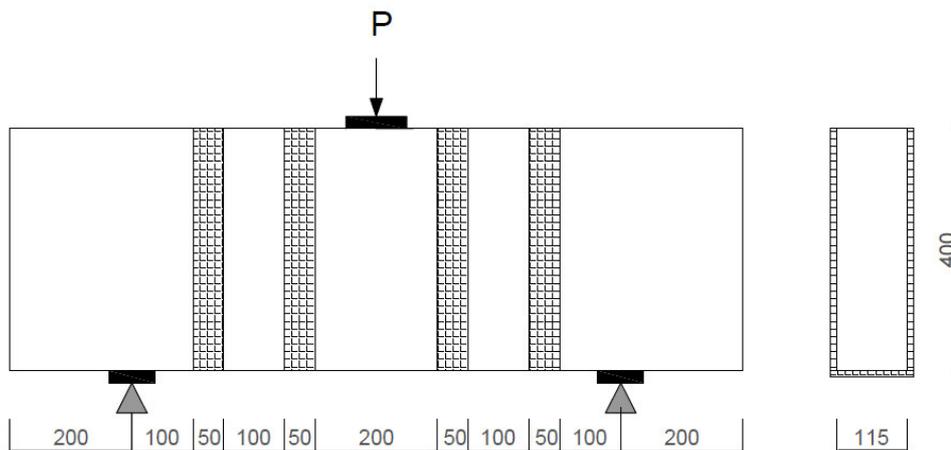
Details of retrofitted tested beams (All dimensions are in mm).
